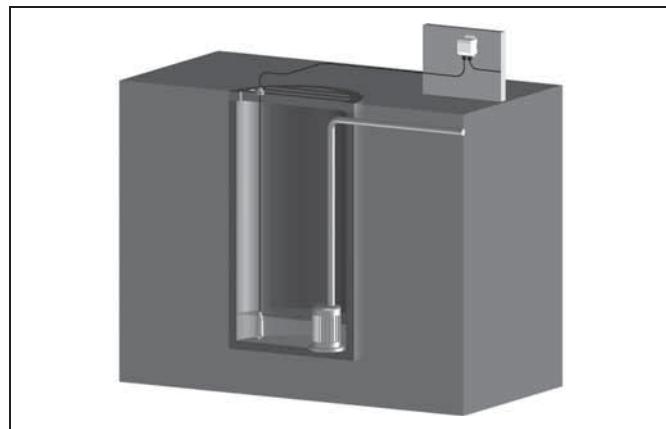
VEGA WELL 52 in a pump shaft with VEGABOX 02
